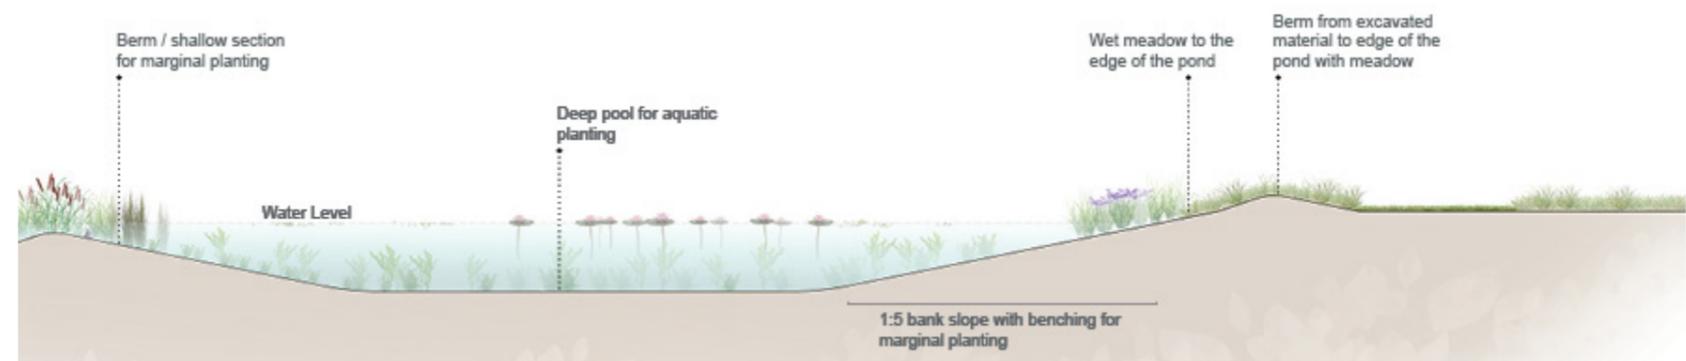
Typical cross section through attenuation pond, designed for wildlife #2
